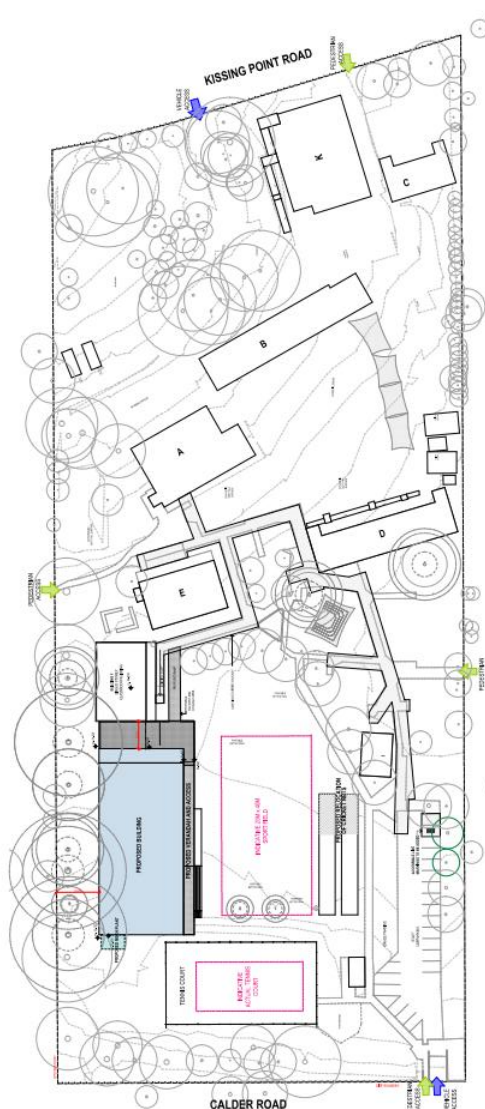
Proposed Scope of Works (Source: Fulton Trotter Architects, Proposed Site Plan (Rev P5))
